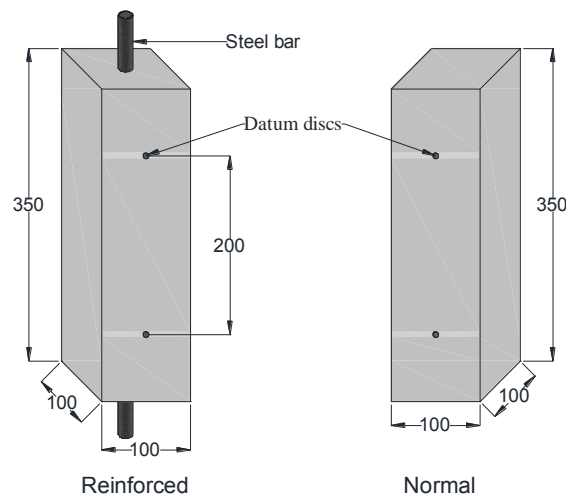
Specimens of thermal expansion test with datum discs glued on.
